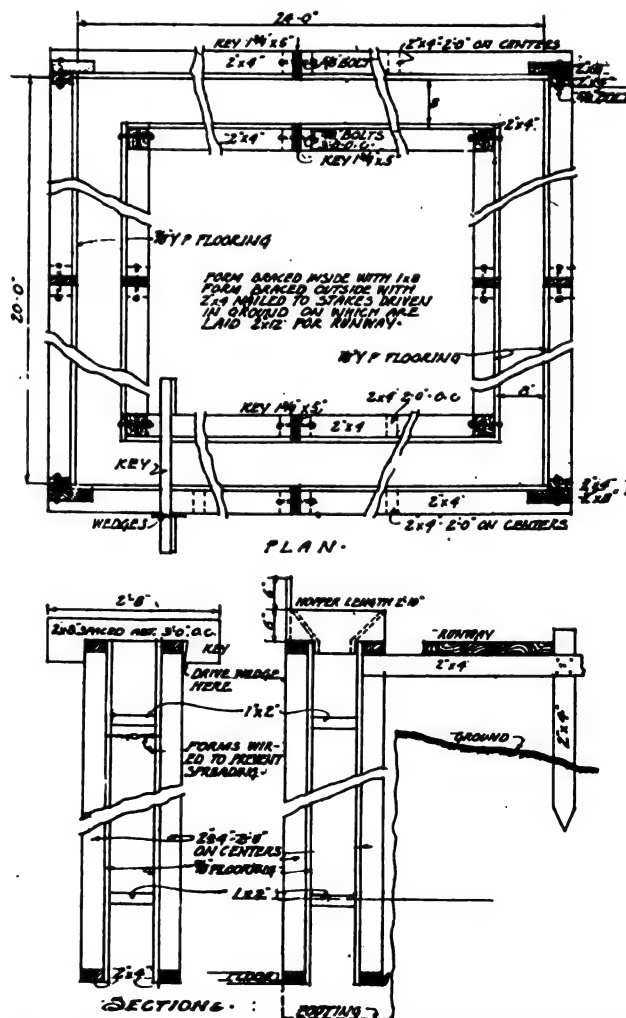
HORIZONTAL AND VERTICAL SECTIONS FOUNDATION FORMS
